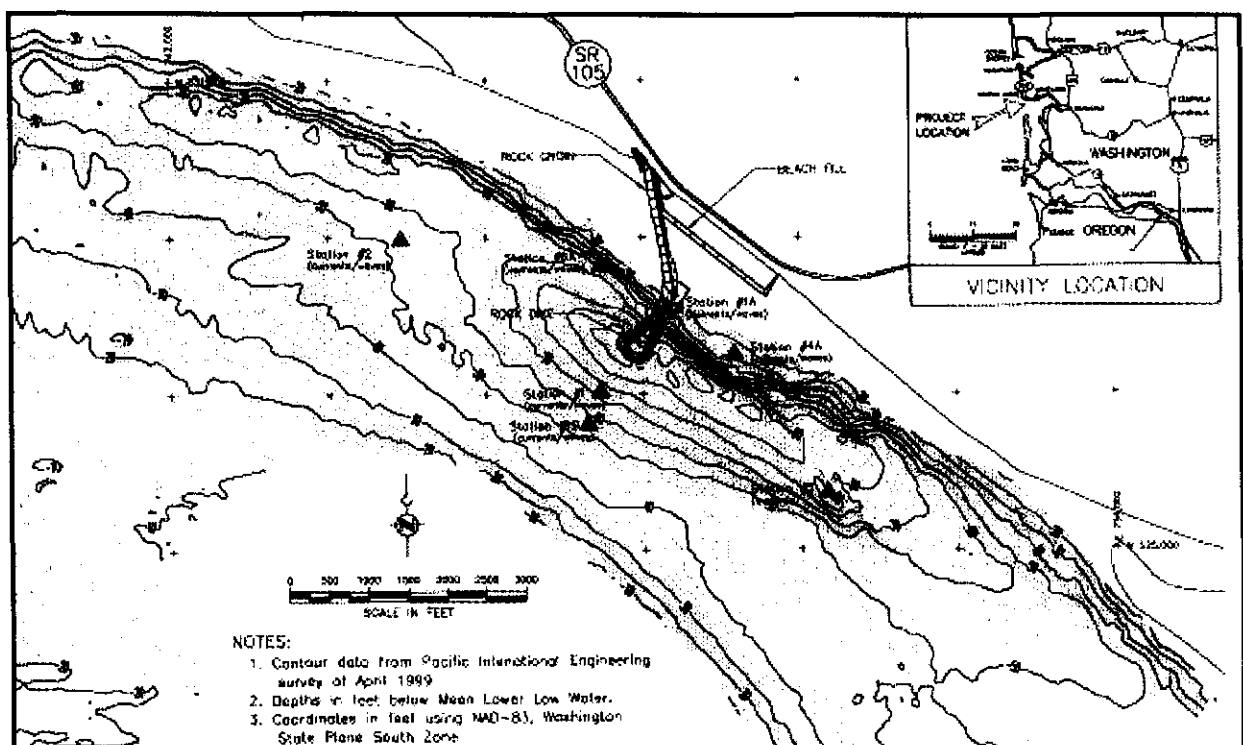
Location of Jacobson's Jetty project site at Washaway Beach, Washington.
